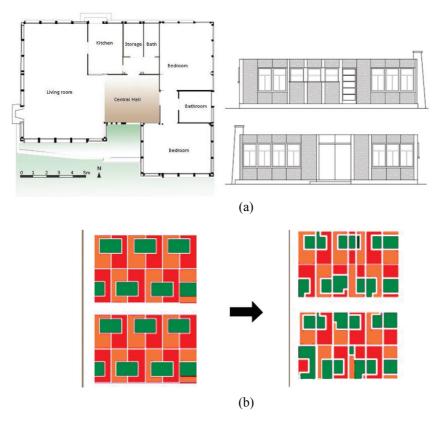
(a) one unit of a Row house (Narmak project) (b) Proposed site plan has changed by residents for having a private yard.
